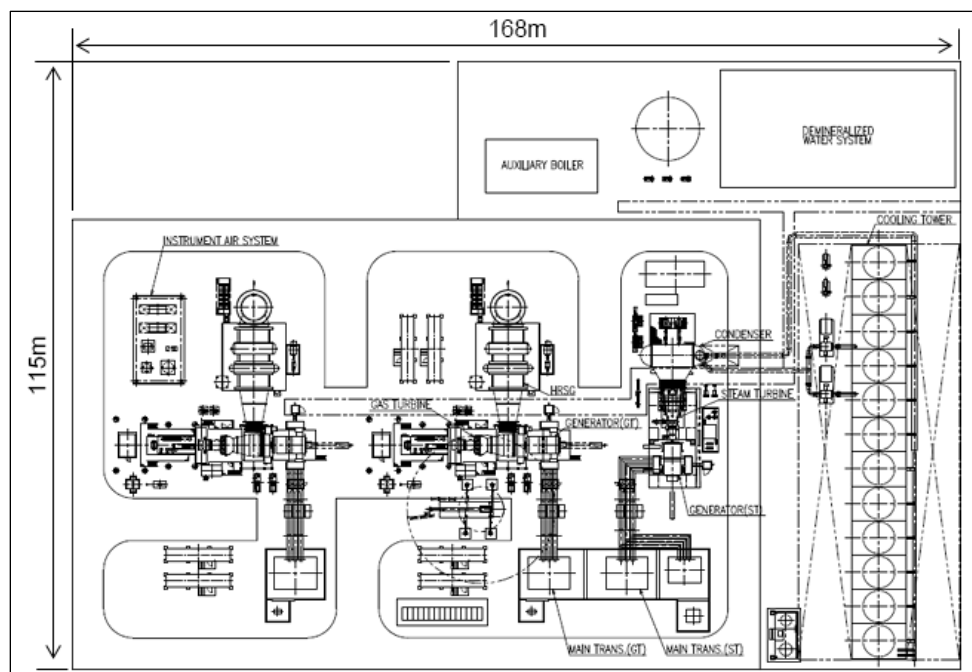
Example of 300-320 MW GTCC LAYOUT
